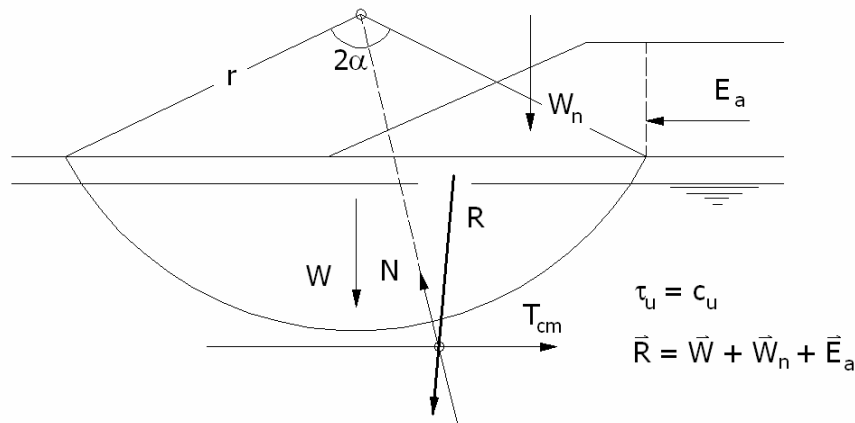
Graphic presentation of determining embankment stability in undrained conditions
